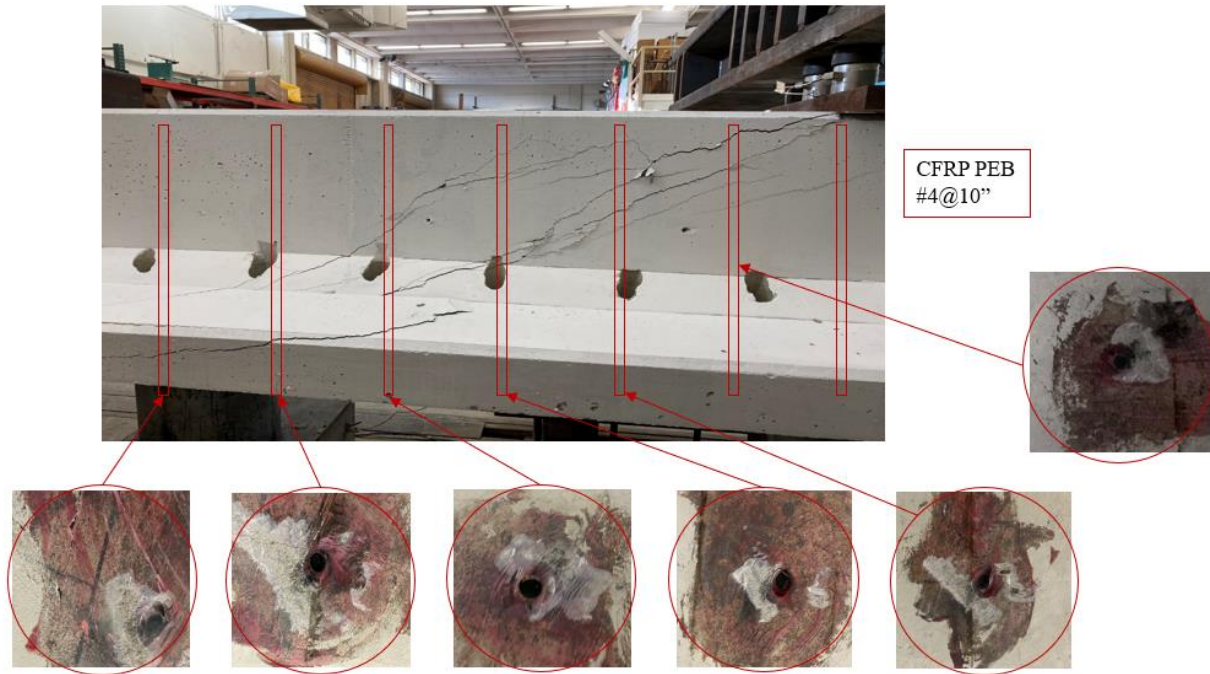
CFRP bars examined after testing in Specimen PEB Scheme I
